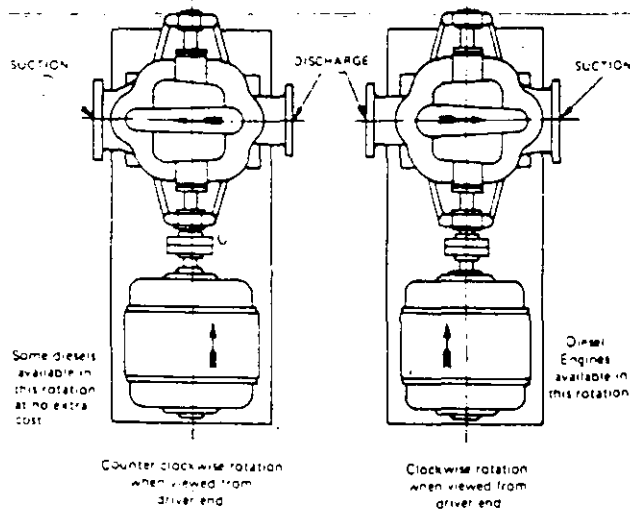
(b) Horizontal Pump Shaft Rotation.
